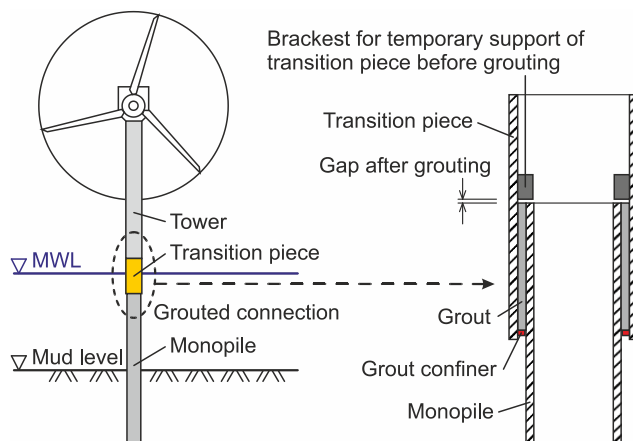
A typical grouted connection in monopile tower according to Lotsberg (2013).
